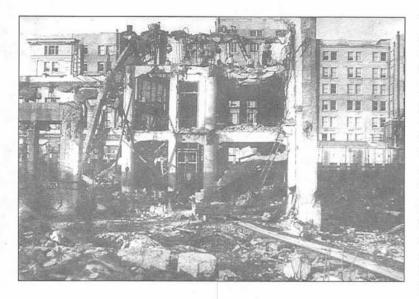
This 8-story reinforced concrete building was one of scores that collapsed during the 1923 Tokyo (Kanto) earthquake. The disaster prompted a limit on building heights. (Source: Carl V. Steinbrugge Collection, Earthquake Engineering Research Center)
